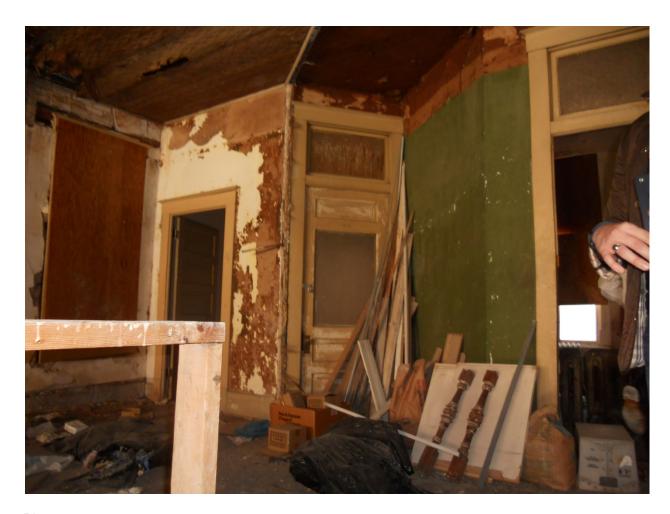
Third Floor Little Soledad Building Looking Southwest Feb. 24, 2016
